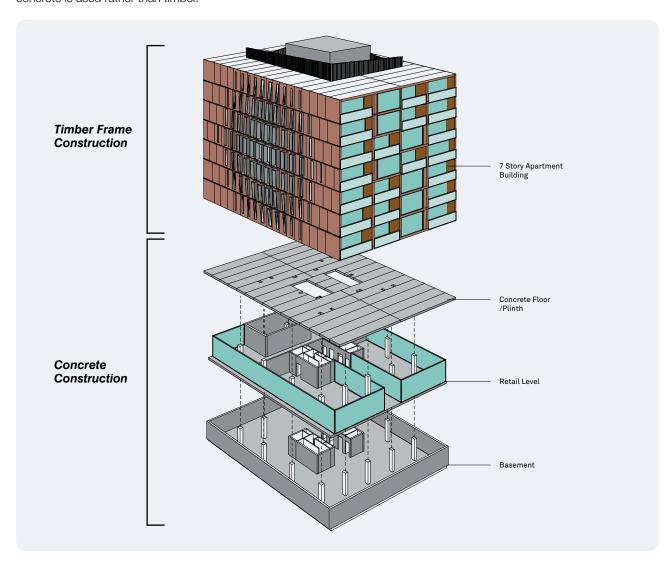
Typical timber apartment constructed over a concrete podium.
